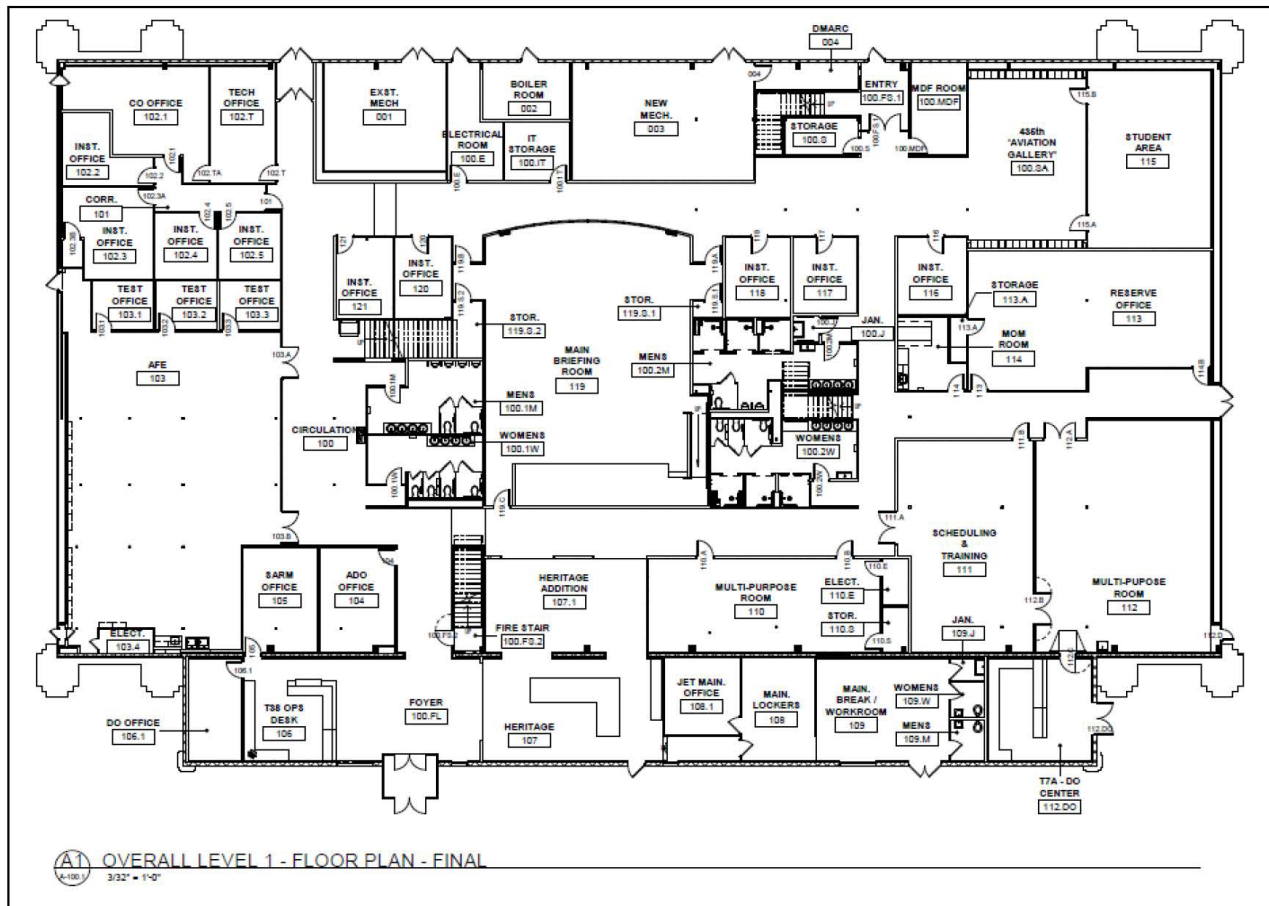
Proposed First Floor Plan. Note: façade at top of image, existing rear addition at bottom of image. No changes would occur to exterior materials or fenestration pattern or materials. All alteration to building interior.
